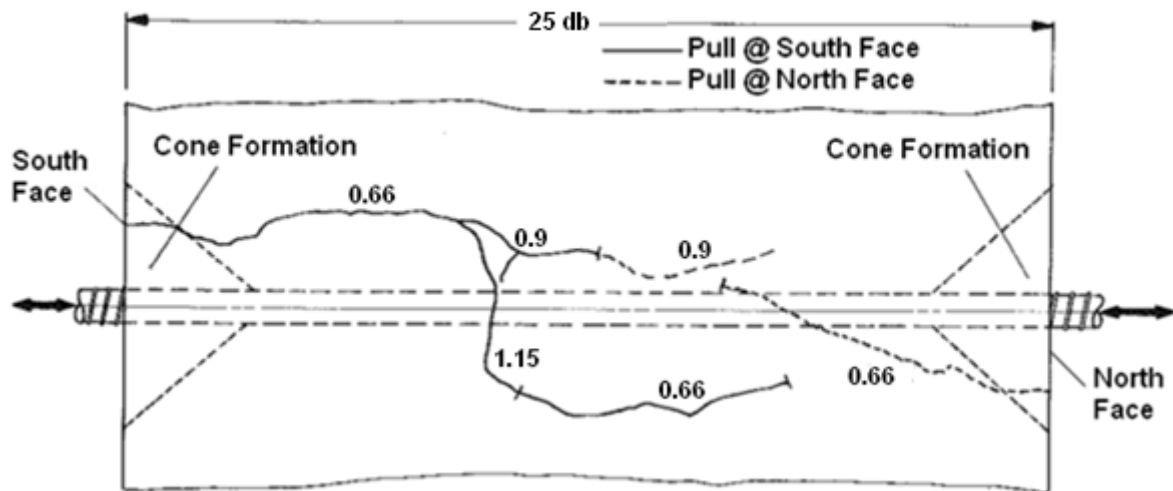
Typical crack pattern on top side of cyclically loaded specimen. Adapted from Viwathanatepa et al (1979)
